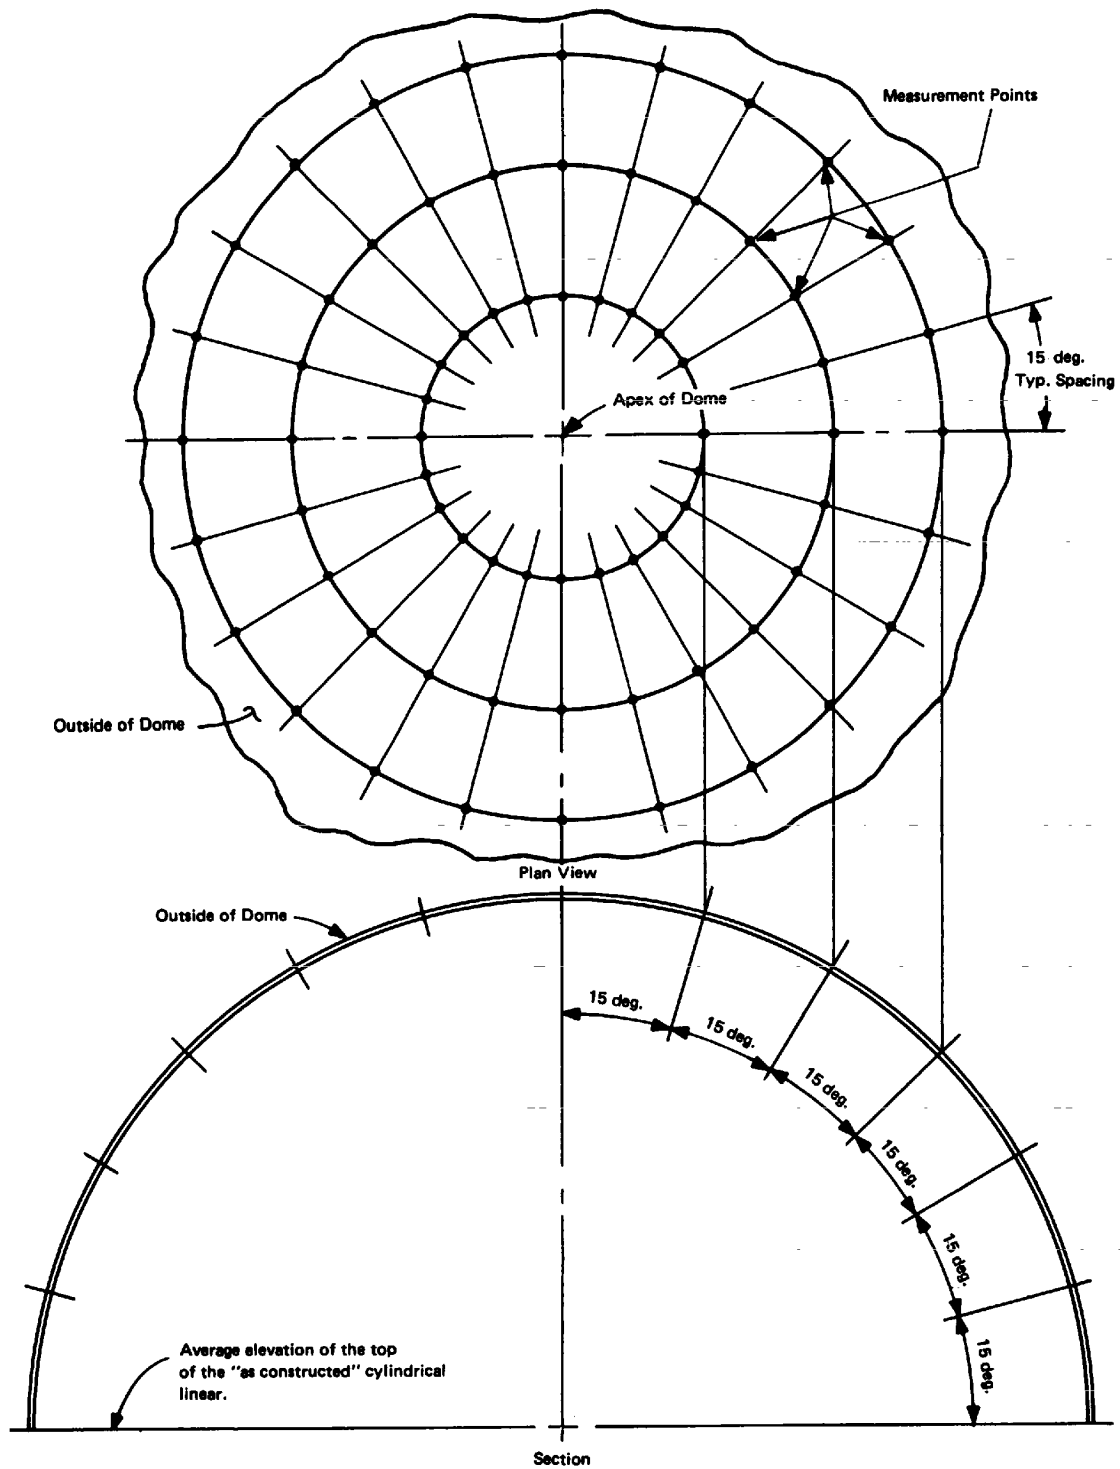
MEASUREMENT POINTS PER F-1320
